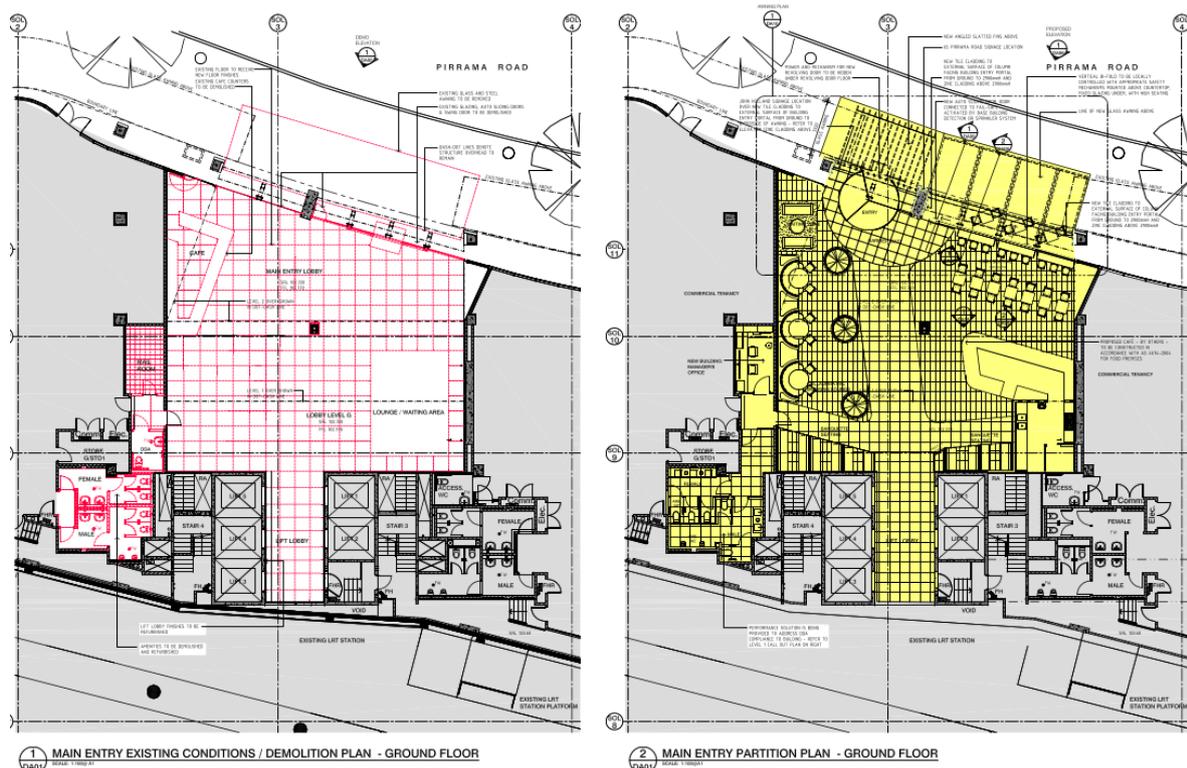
Existing and proposed food and drink premises (cafe) facing Pirrama Road.
